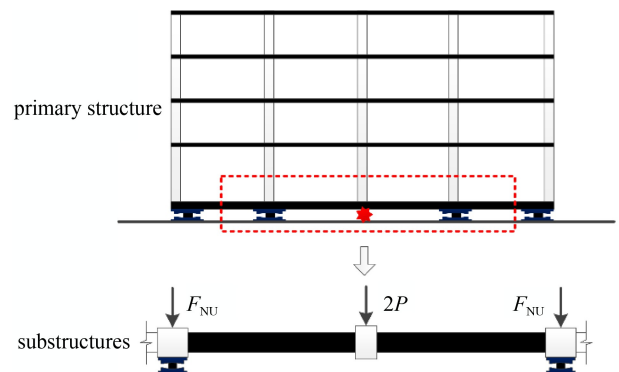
Schematic of FPB isolated beam-pier substructure.
